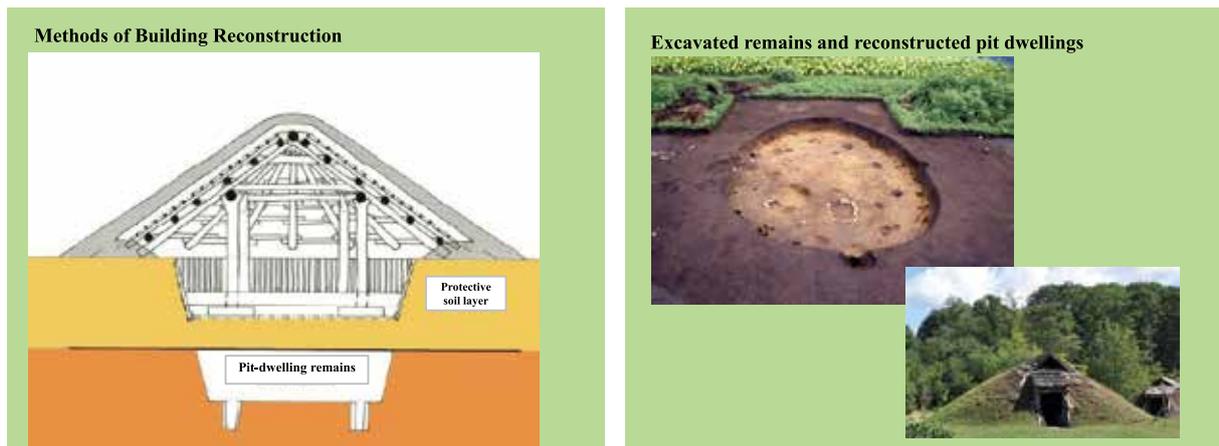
Profile of reconstructed pit dwellings and remains of stone arrangements
